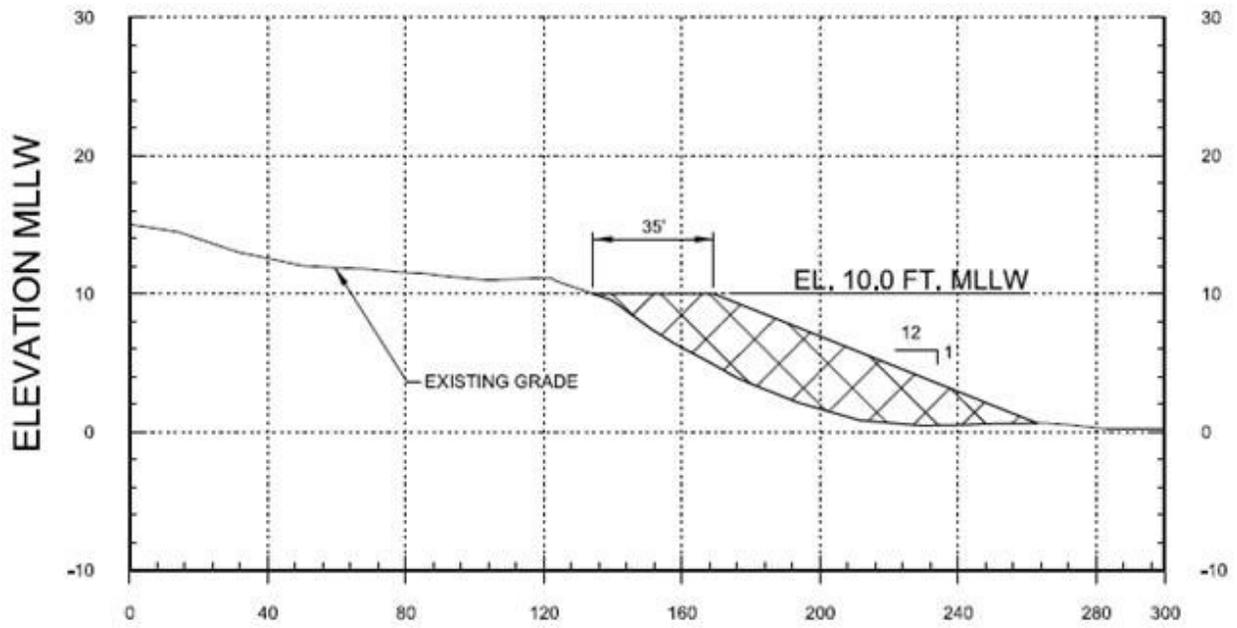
Newport Beach Sand Backpass Fill Cross Section
